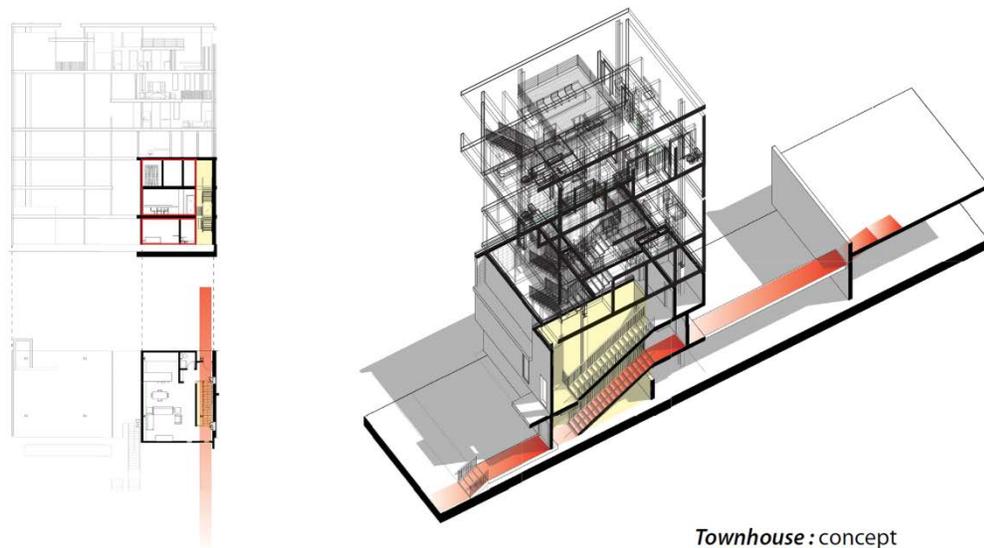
Diagram of Townhouse Concept (source: Author)
